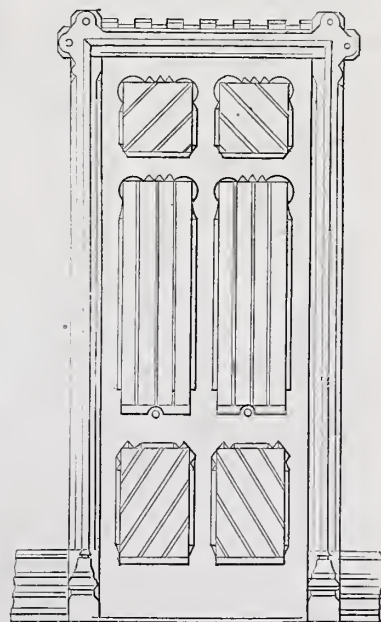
Elevation of Inside Door and Door Trimmings.—Scale, 3/8 Inch to the Foot.
